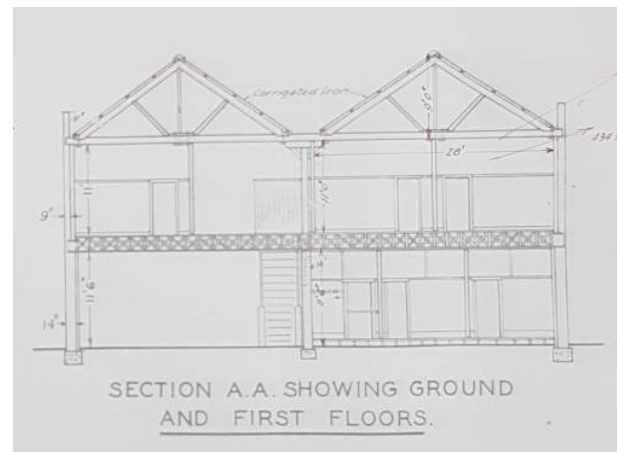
1933 drawings – section of the proposed double-gabled building (PROV, 1933).
